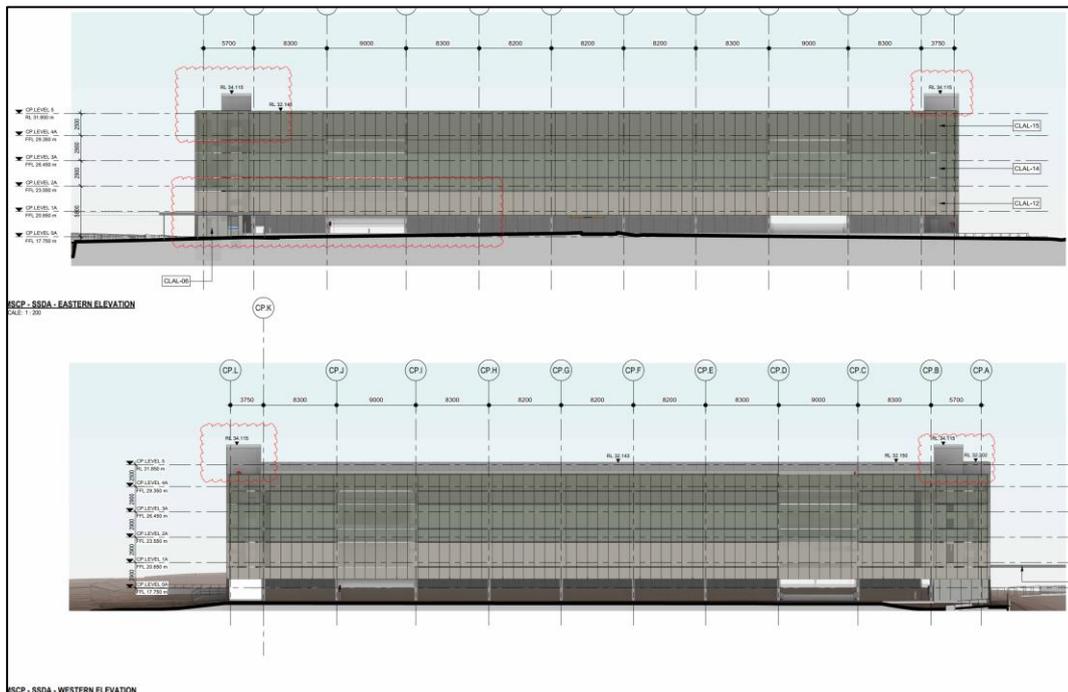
Modified Multi-deck Carpark East and West Elevations
